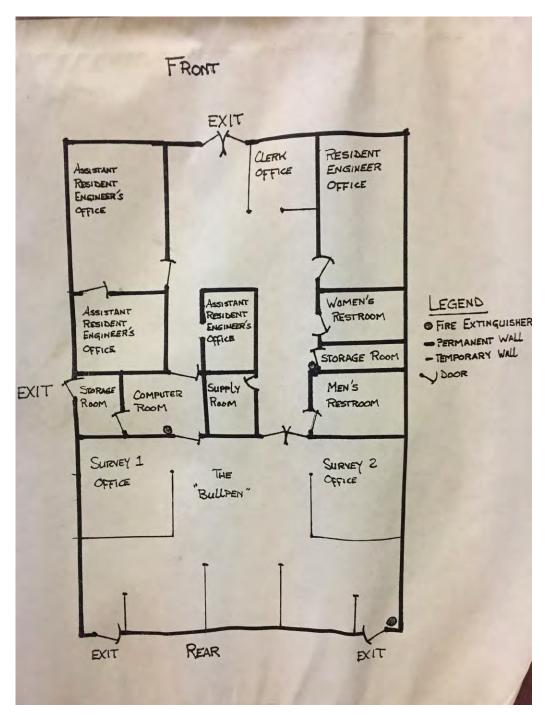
Interior floorplan of the old Teamsters Union Local 391 Building created by the NCDOT.
